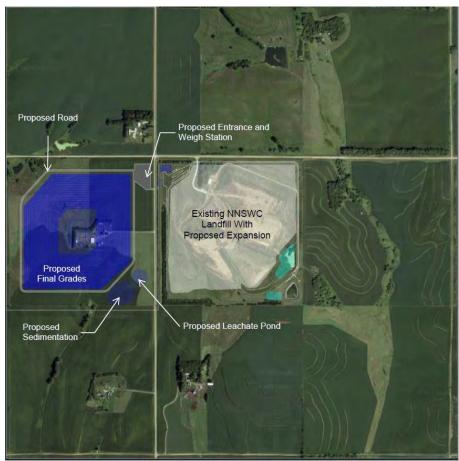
Proposed NNSWC West Off-Site Expansion Option Infrastructure Layout and Grading Plan
